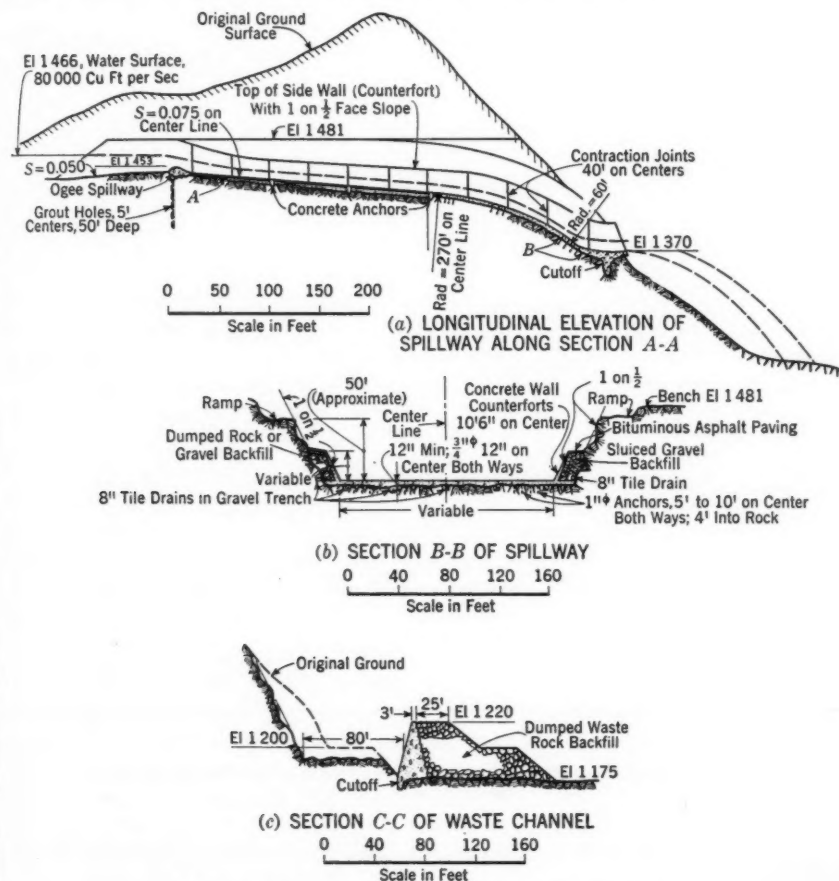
SECTIONS, SAN GABRIEL DAM NO. 1 (SEE FIG. 1)
